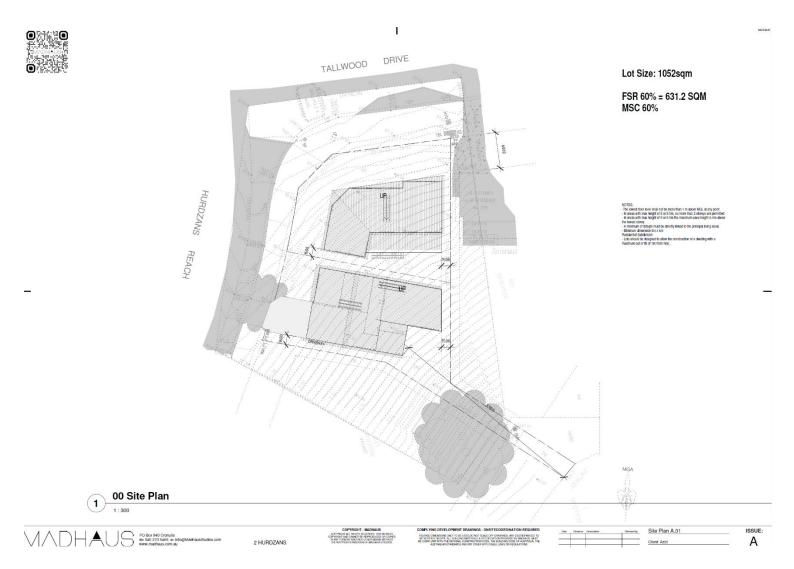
Site plan showing proposed dual occupancies within subject lot (Source: Madhaus Building Design)
